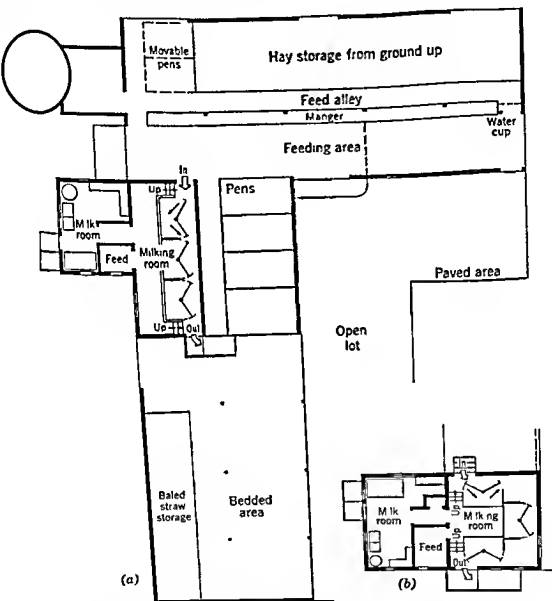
Floor plans of a loose-housing arrangement, showing in-line milking stalls together with cow and calf pens. The inset shows a similar arrangement, except that the milking room is of the U-type. (Cir 694 Ill Agr Exp Sta.)
